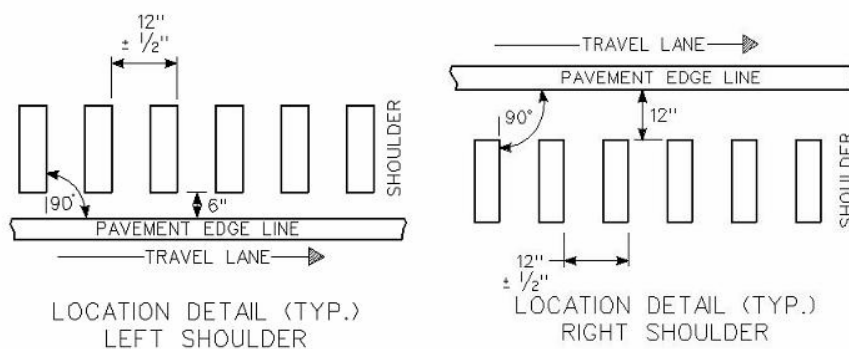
The Physical Dimensions and Typical Cross-Section of a Rumble Strip.
